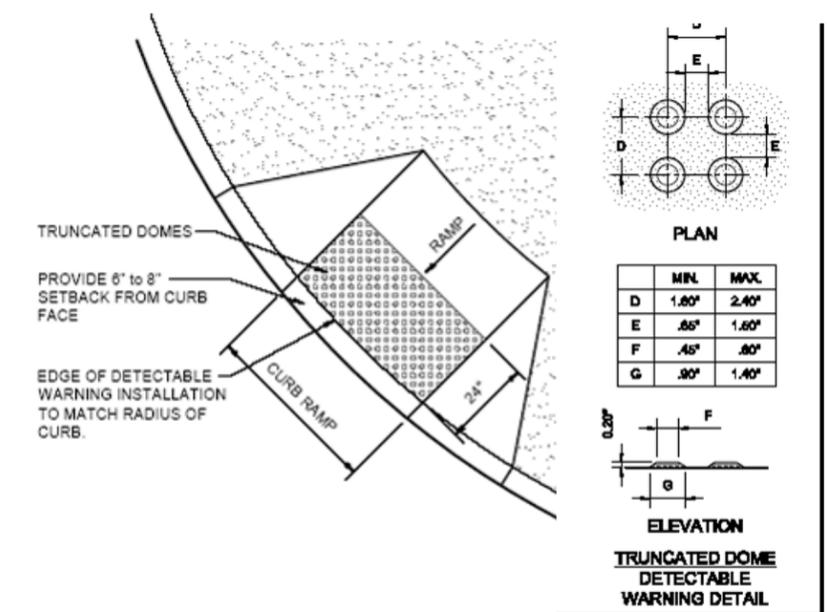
Cross section of an ADA ramp (Source: US Access Board)
